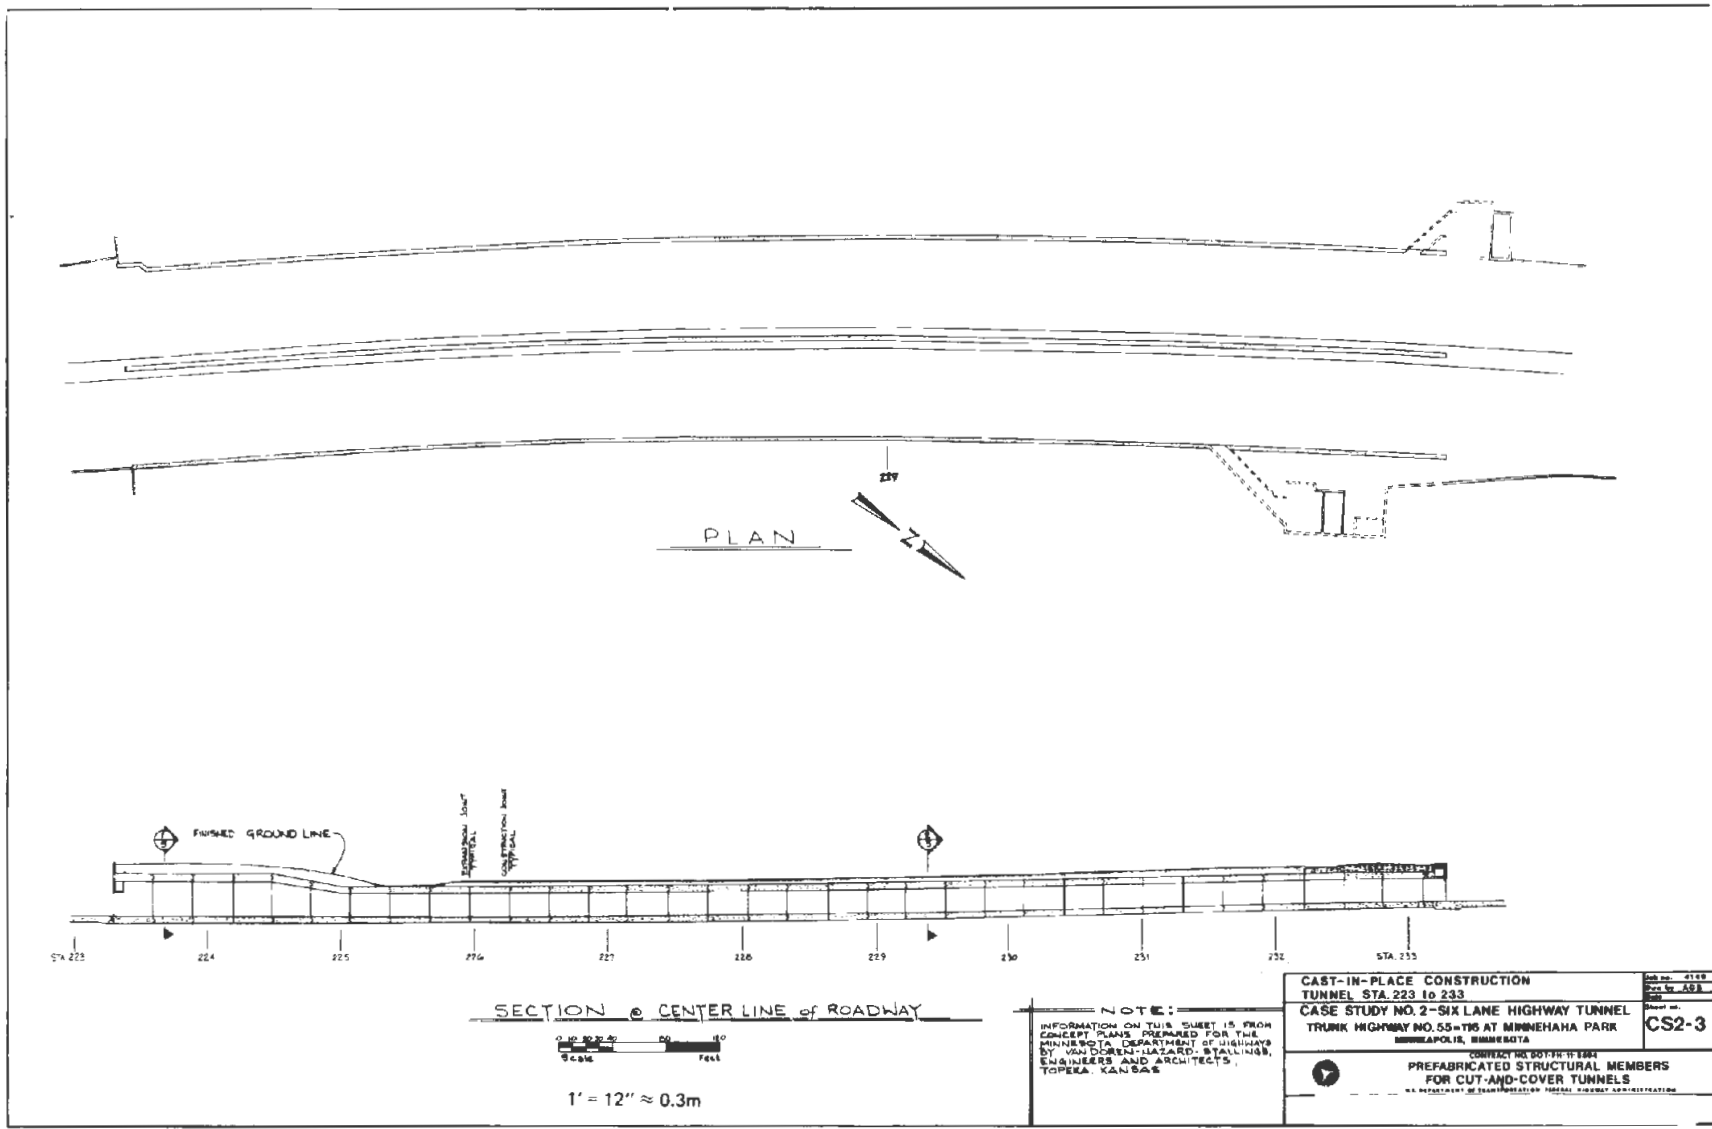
Case Study 2: Cast-in-place construction. Tunnel Sta. 223 to 233
